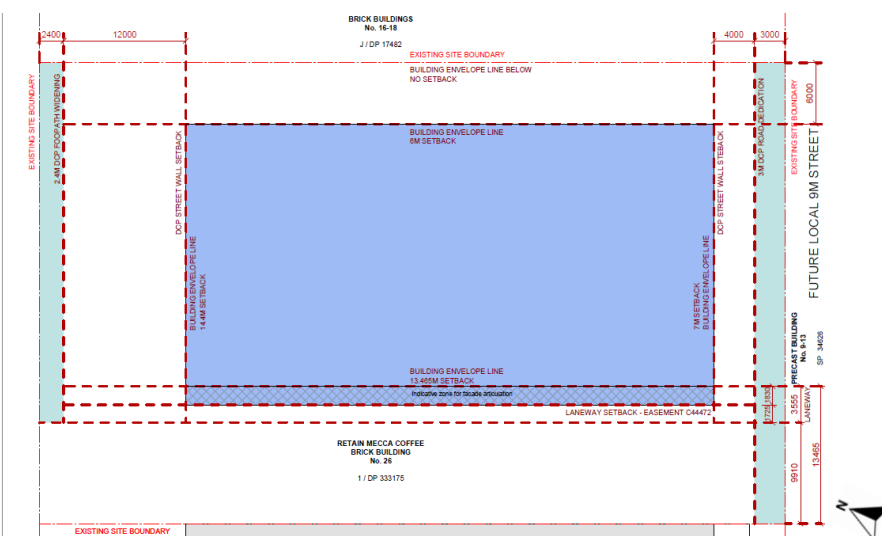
Envelope Plan - Level 5/6/7/8/9/10/11
